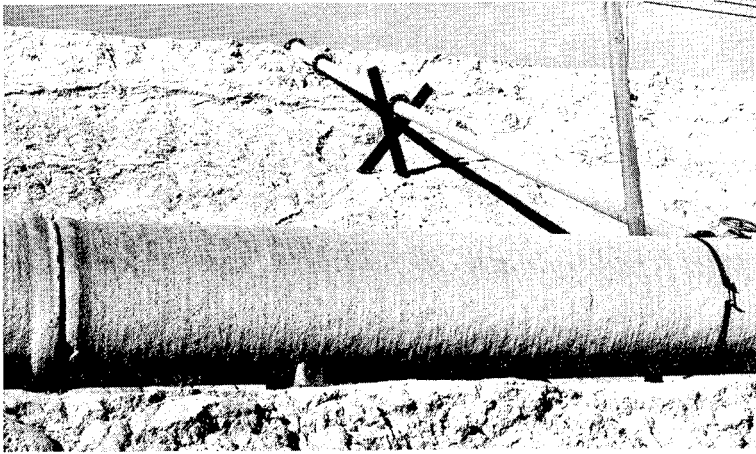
PHOTO A. LARGE DIAMETER, REINFORCED CONCRETE HEADER PIPE AT MORENCI, ARIZONA.
